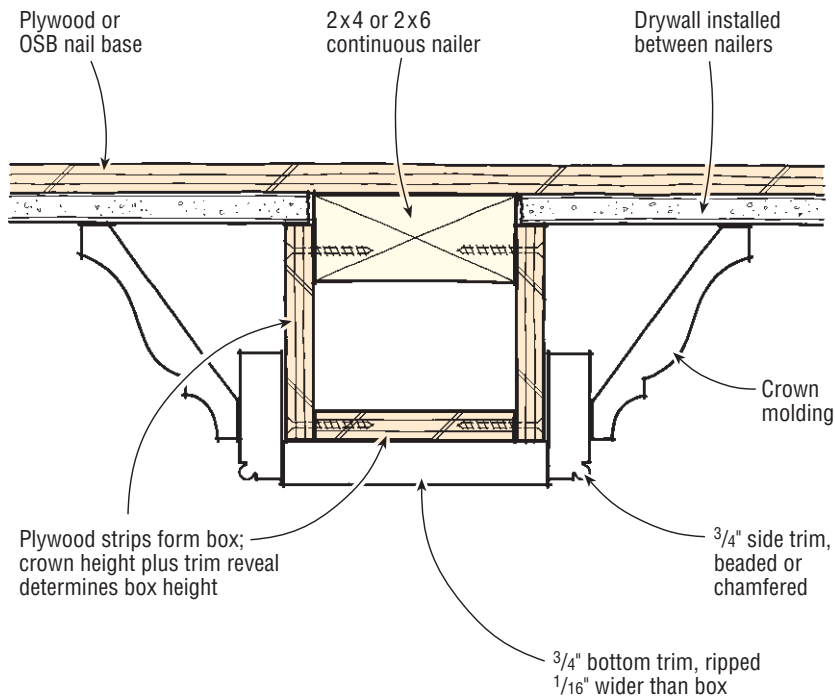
A continuous layer of plywood installed over the ceiling framing provides a solid base for dimension-lumber nailers. After the drywall has been hung and painted, the coffers are assembled from ripped strips of plywood, prefinished flat stock, and crown molding.
